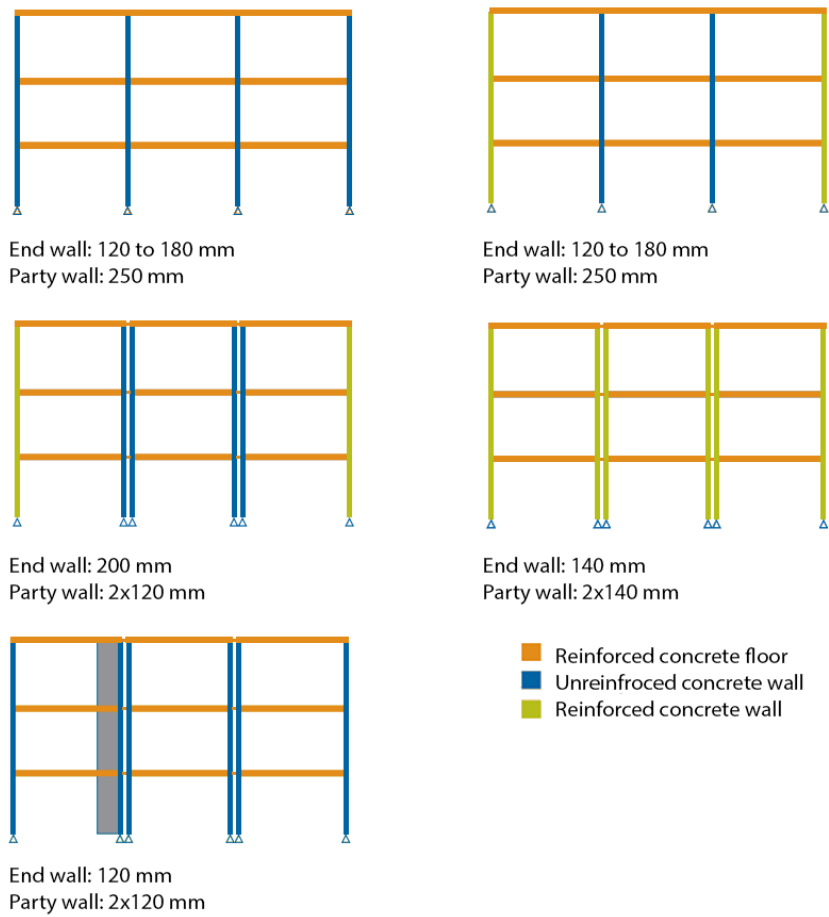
Stability systems in-situ concrete residences adapted from VOBN
